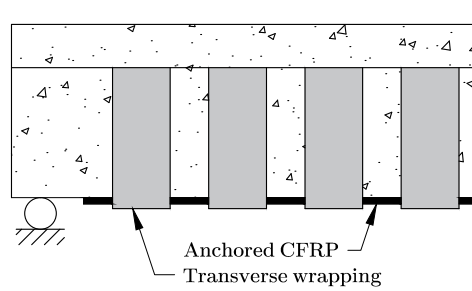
CFRP laminates anchored with the transverse wrapping system on a concrete T-beam.
